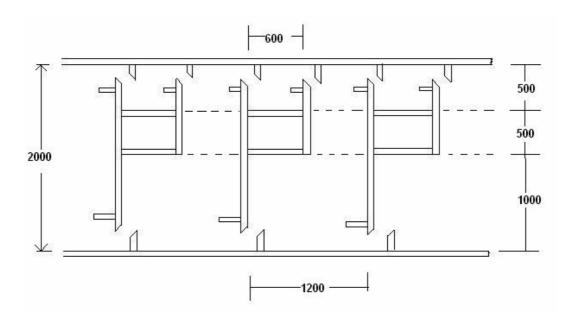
Plan view of proposed Twin Channel Vertical Slot Fishway
